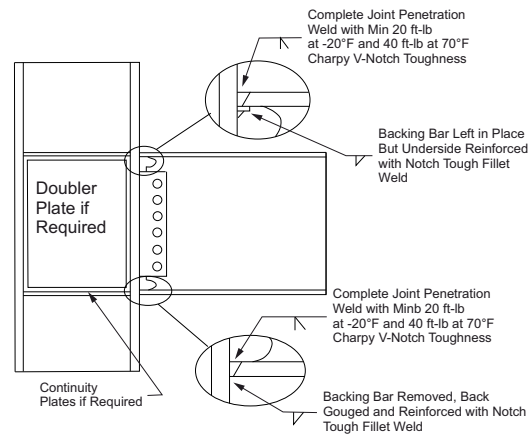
Improvements in the welding techniques for the WUF-B connection
